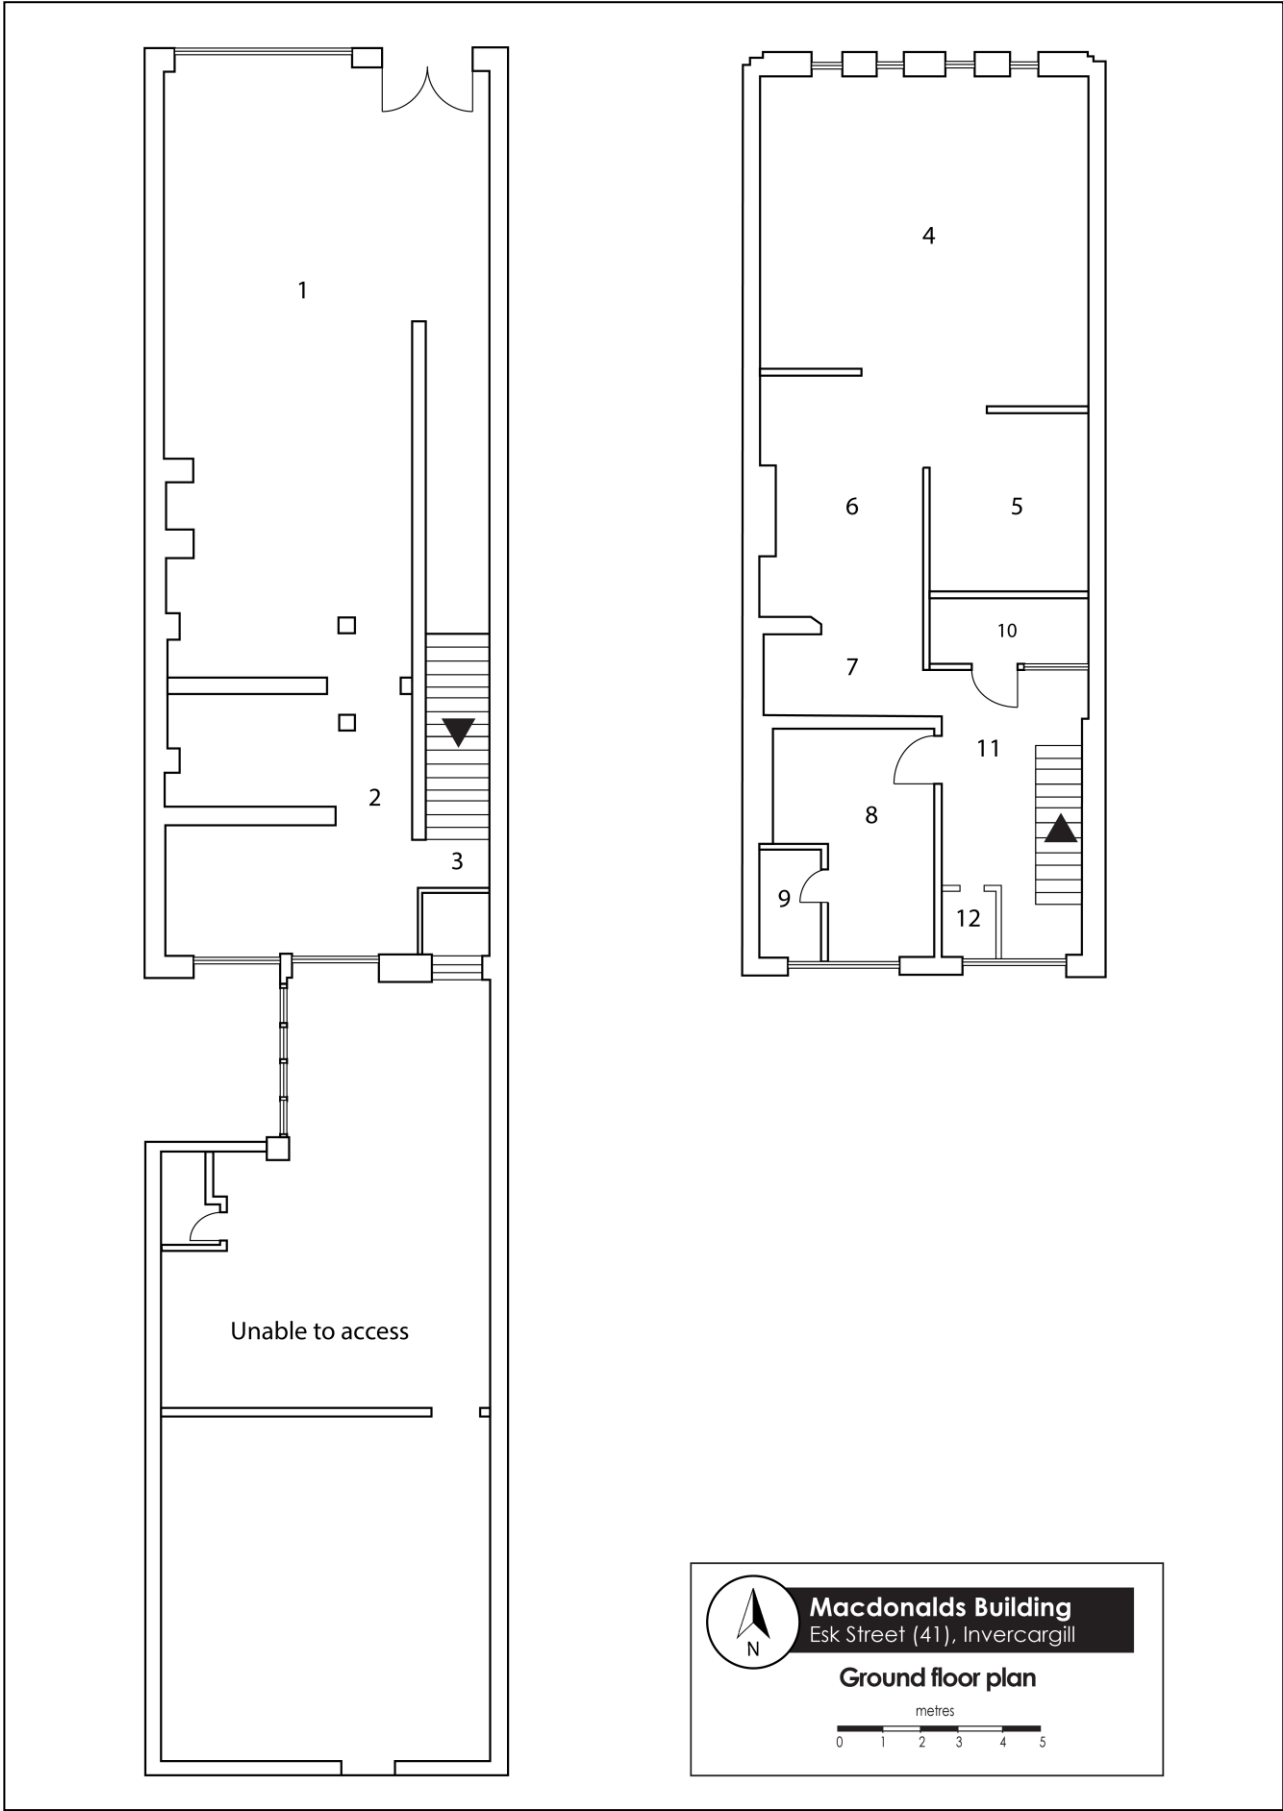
Ground (left) and first (right) floor plans of MacDonald's Building.
